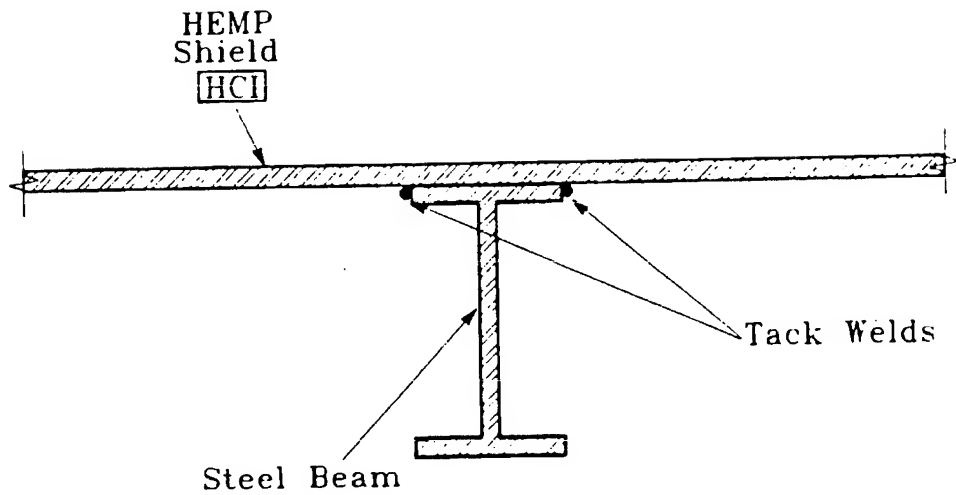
Steel beam not incorporated into the HEMP barrier.
